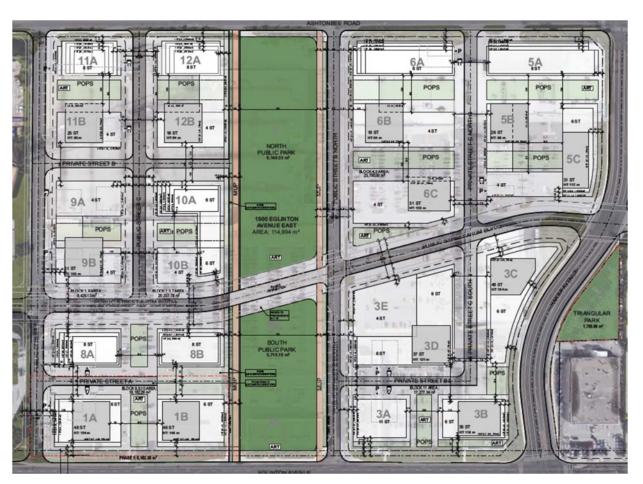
Master Plan showing potential redevelopment of the Subject Lands
